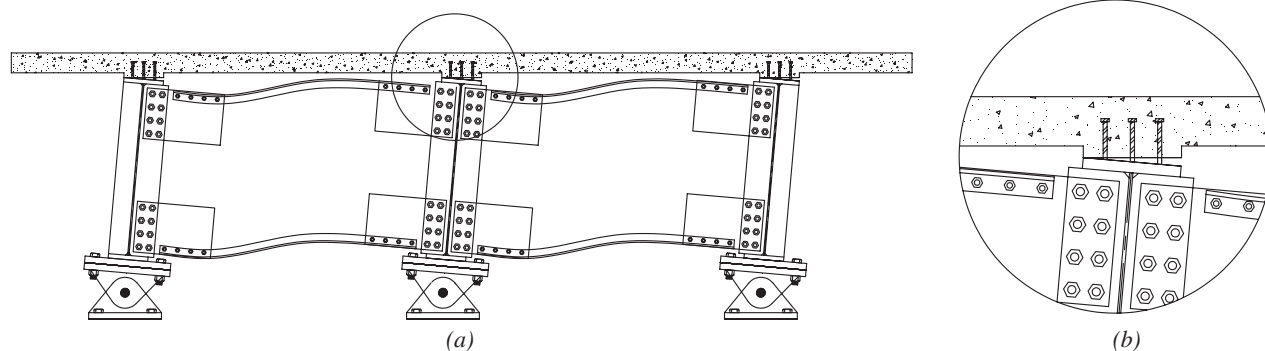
Specimen F0A: (a) deformed shape of subassembly; (b) rotation at deck-girder joint.
